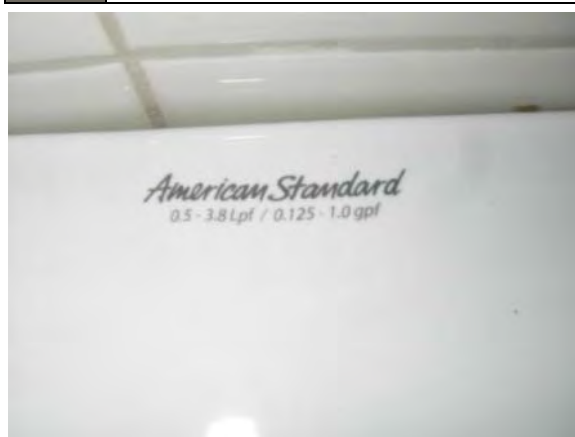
1902 BUILDING BASEMENT BOY'S RESTROOM STANDARD TOILET
